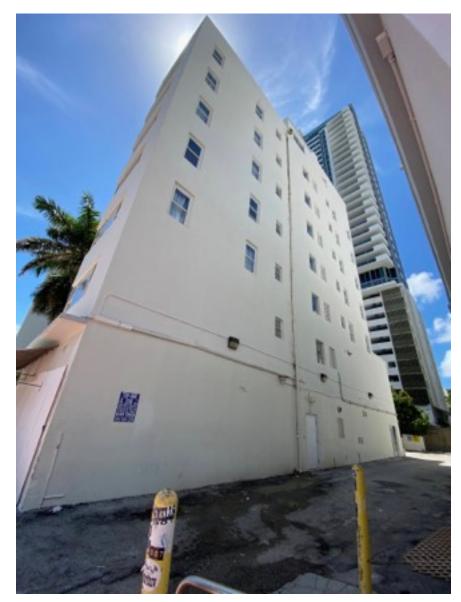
PHOTO LEFT: WEST ELEVATION OF BUILDING AT ALLEY ENTRANCE FROM 21st STREET..
